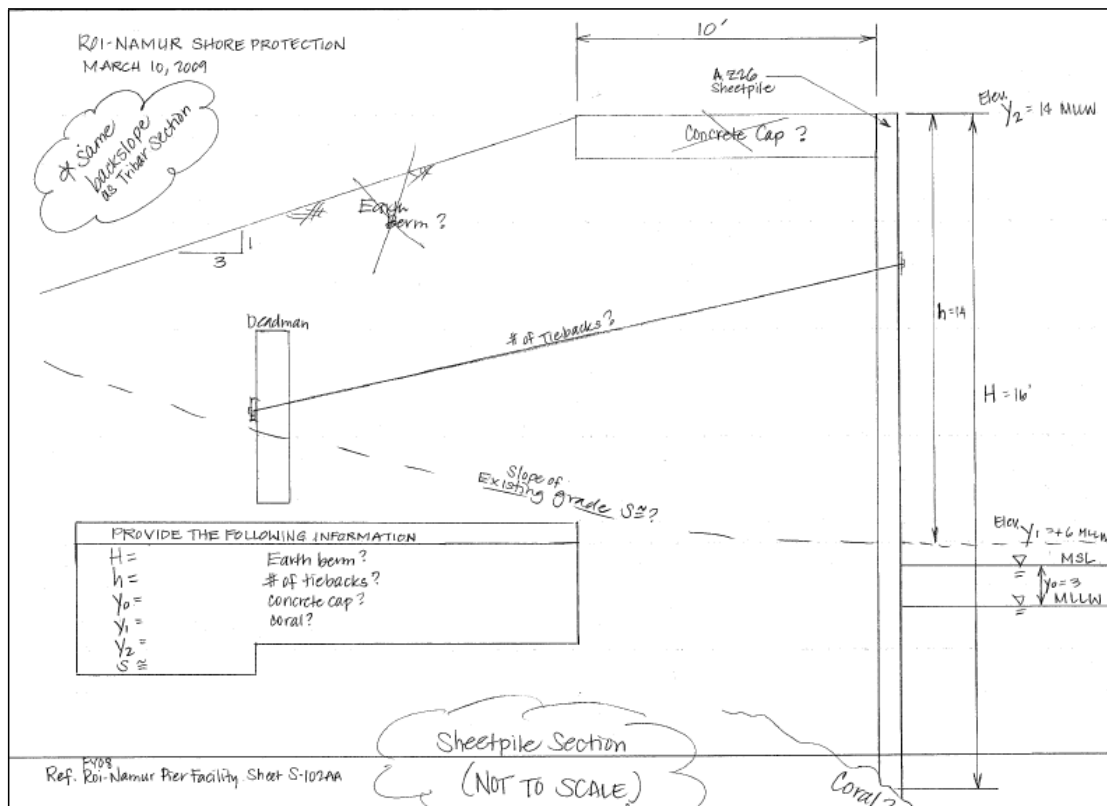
Steel sheet pile wall cross section used for conceptual cost estimates in this report.
